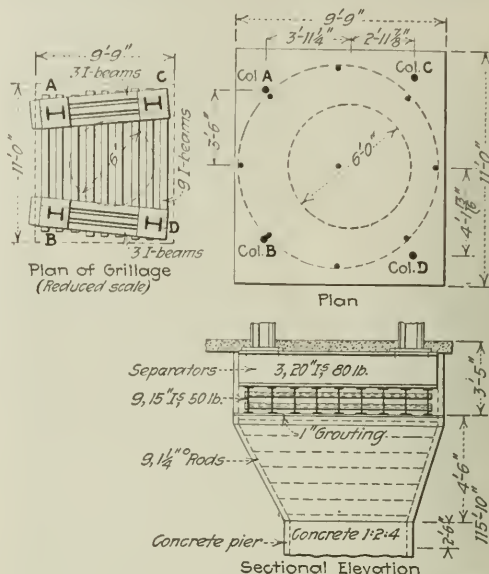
FLARING HEAD OF FOUNDATION PIER CARRIES FOUR STEEL COLUMNS
